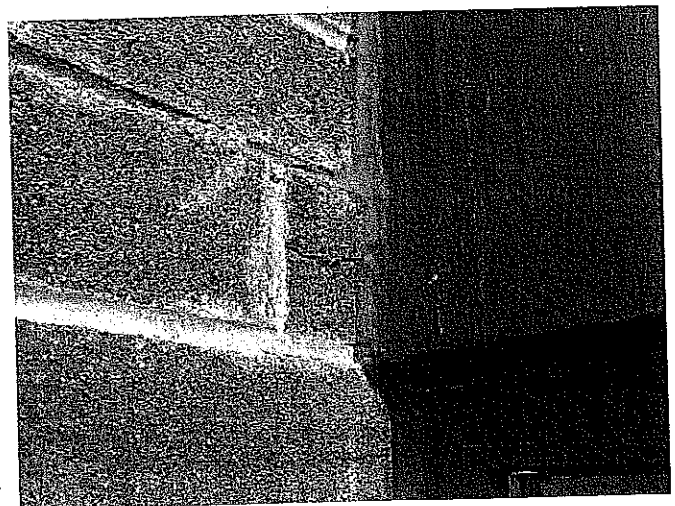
Representation of observed minor damage to masonry cladding.
